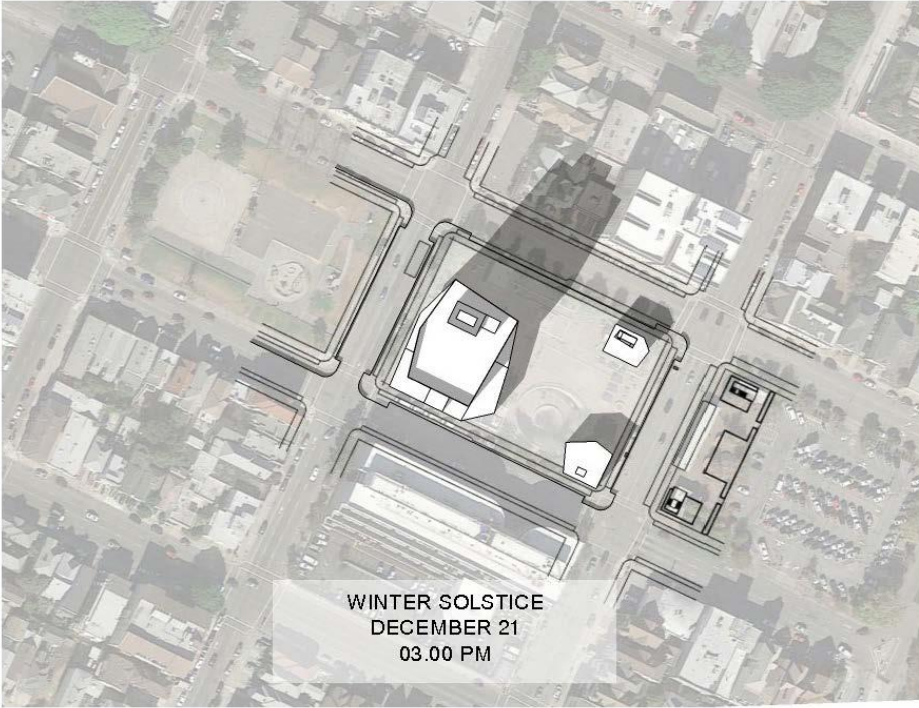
Shadows cast by the proposed TOF building on winter solstice at 3 p.m.
